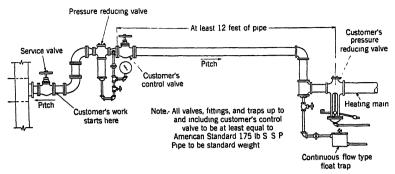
Steam Supply Connection when Using Two Reducing Valves
